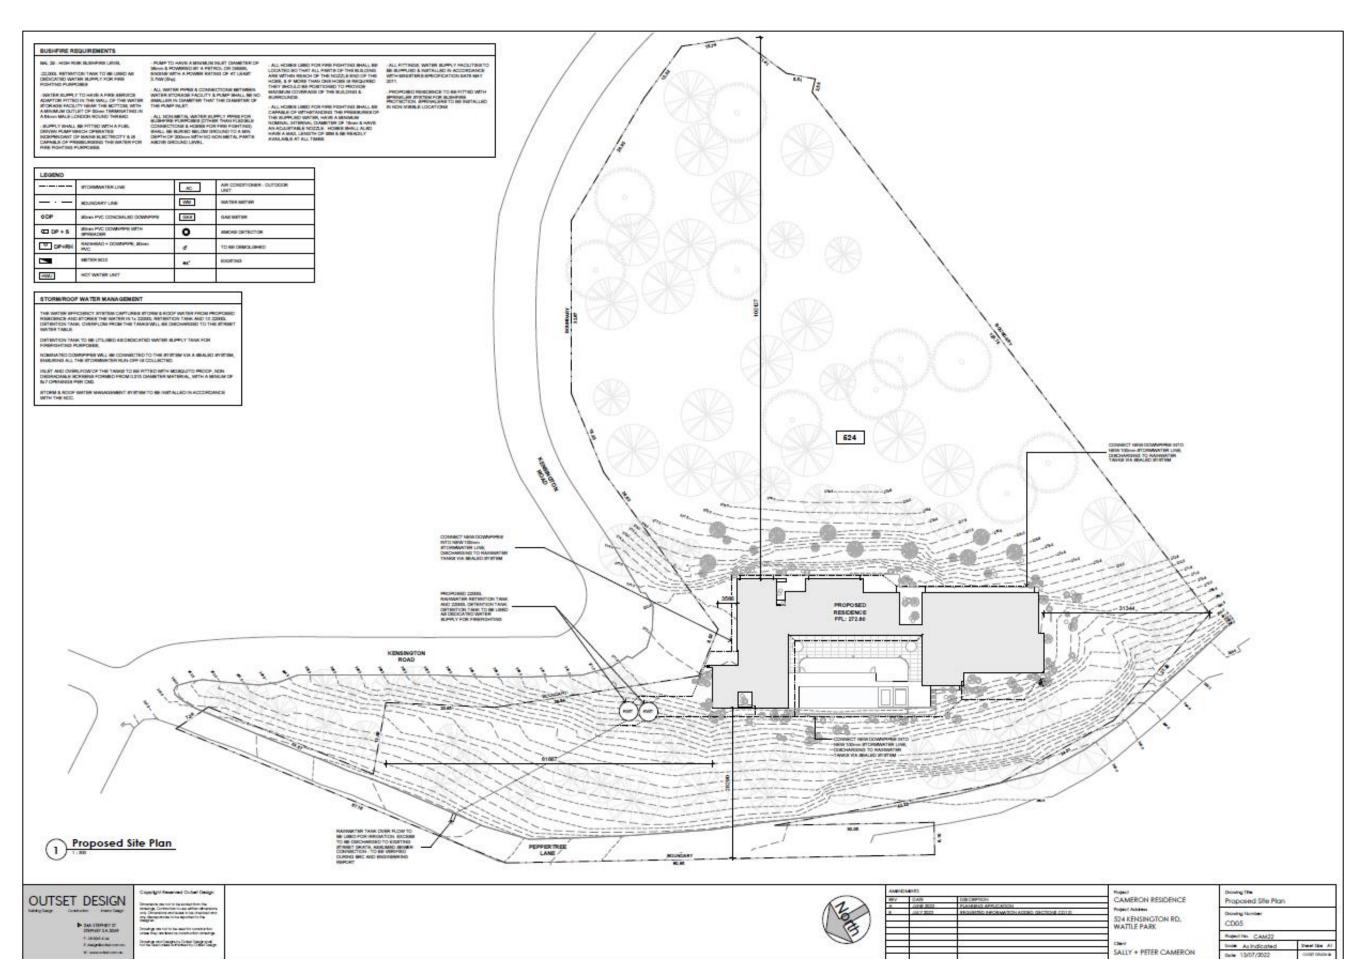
Proposed landscaping plan (provided to EBS on 28/07/2022).
